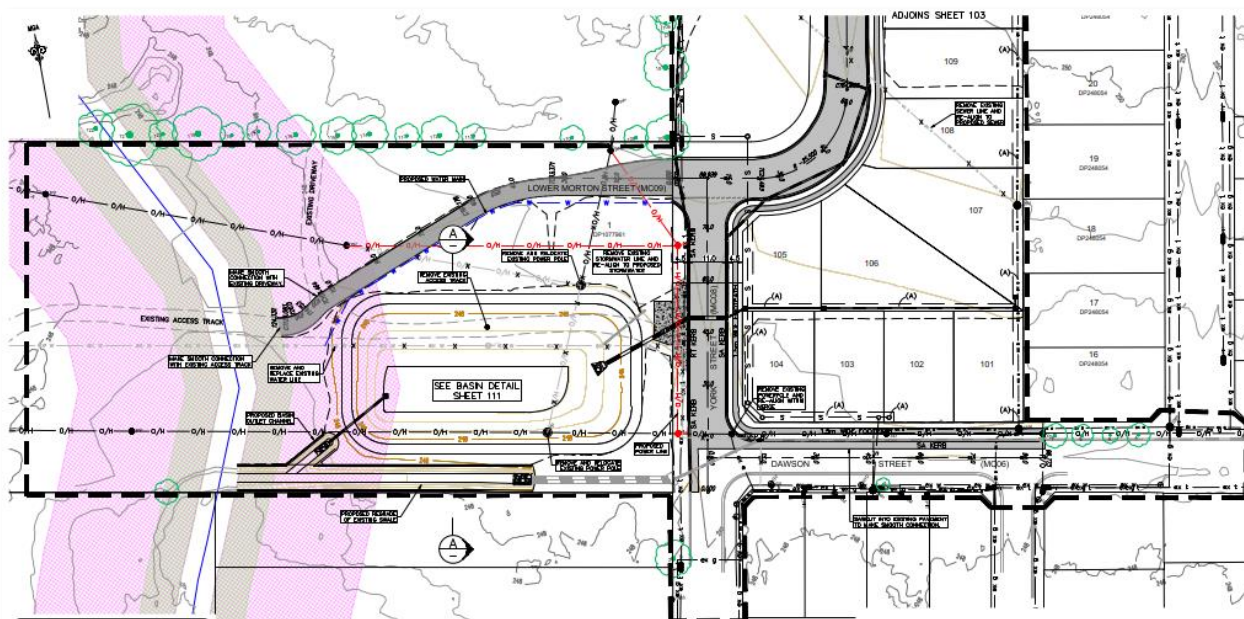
Civil Plan showing the layout of the proposed detention basin (Source: ADW Johnson)
